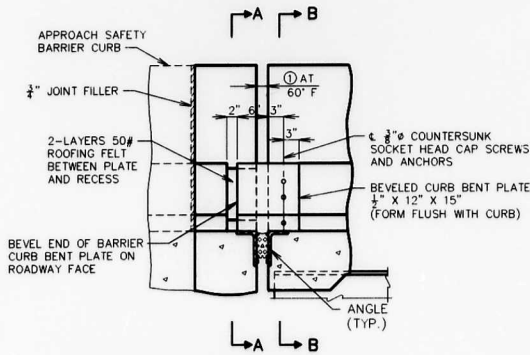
DETAILS OF PREFORMED COMPRESSION JOINT SEAL
